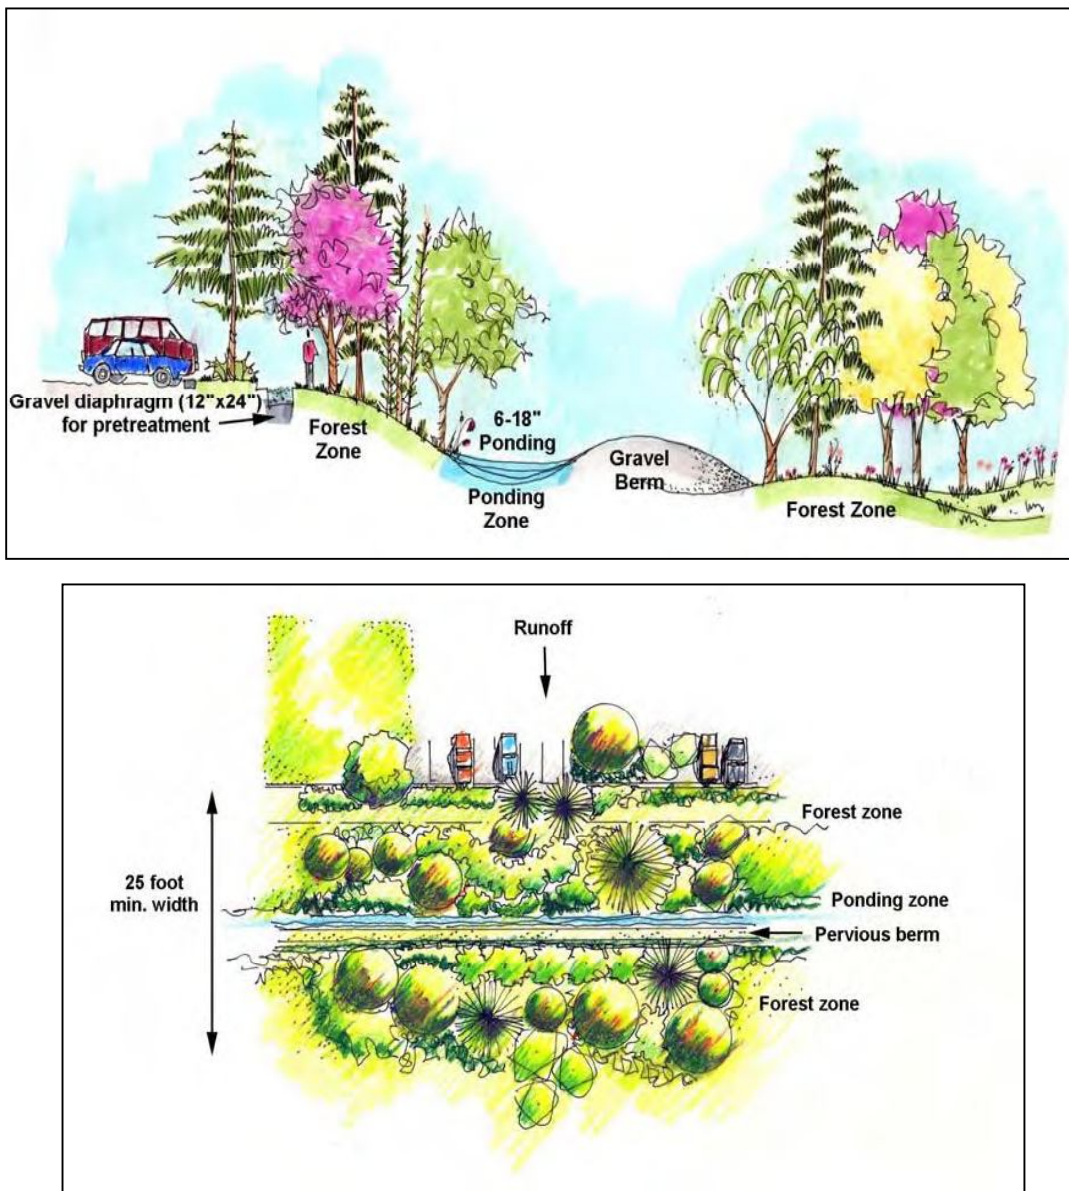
Plan and profile view of simple forested filter strip design for a parking lot.
